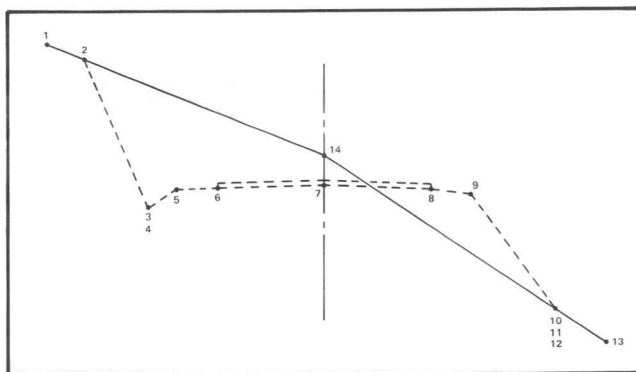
c. Cross section—half-and-half cutting and embankment.
